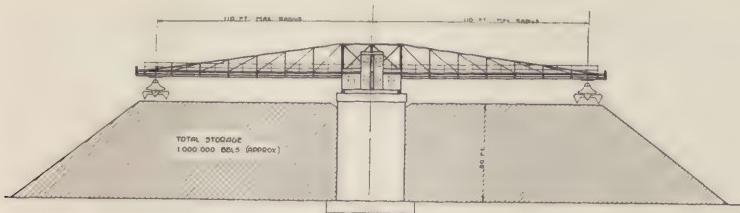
Clinker storage—Riverside Portland Cement Co., Brown Hoisting Machine Co., makers.
